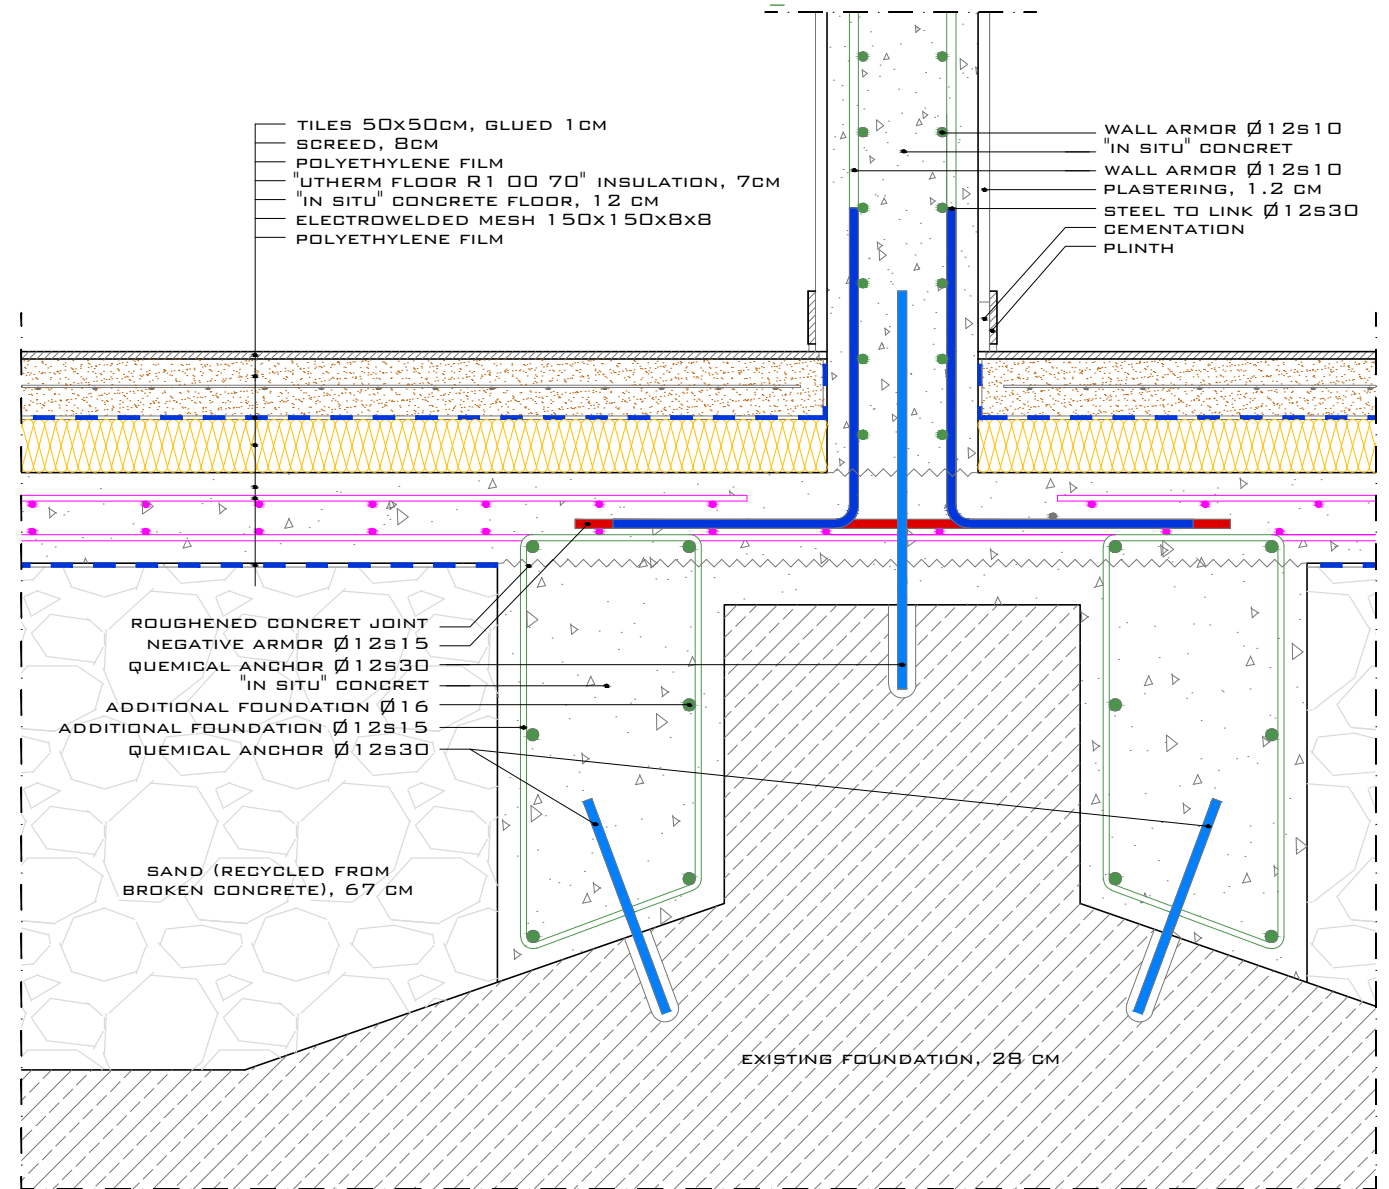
UNION FOUNDATION-COLUMN \_ S:1/10
